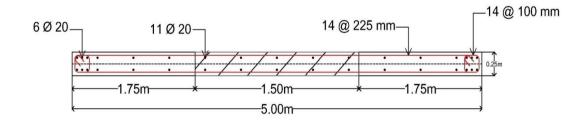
Steel reinforcement of shear wall with opening 1.5mx2.0m (Window)
